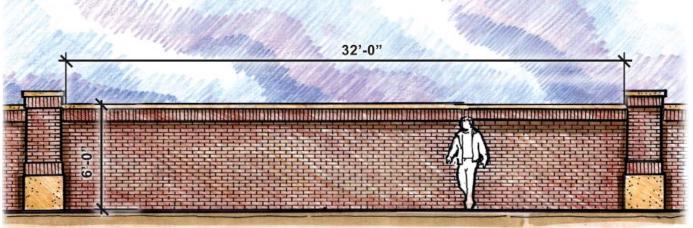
Aesthetic Treatment of Midwest Boulevard - Wall Layout and Elevations
